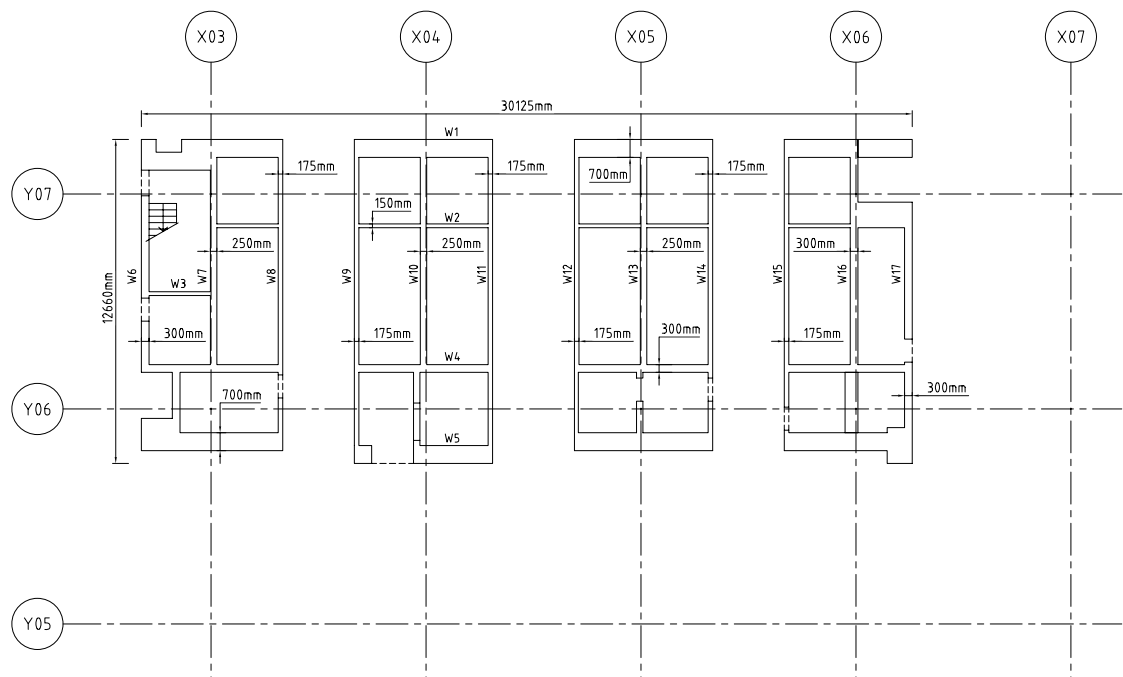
Level 1 Core Plan (Source: Hyder Consulting)
